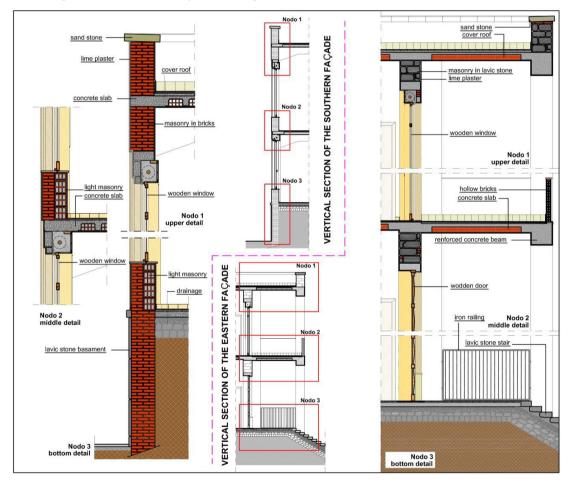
Vertical section of the south façade (left side); vertical section of the east façade (right-side).
